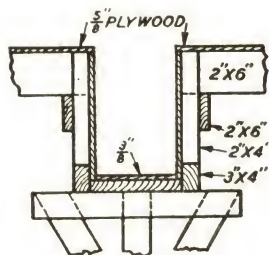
Slab and Beam Forms Constructed of Heavy Plywood
